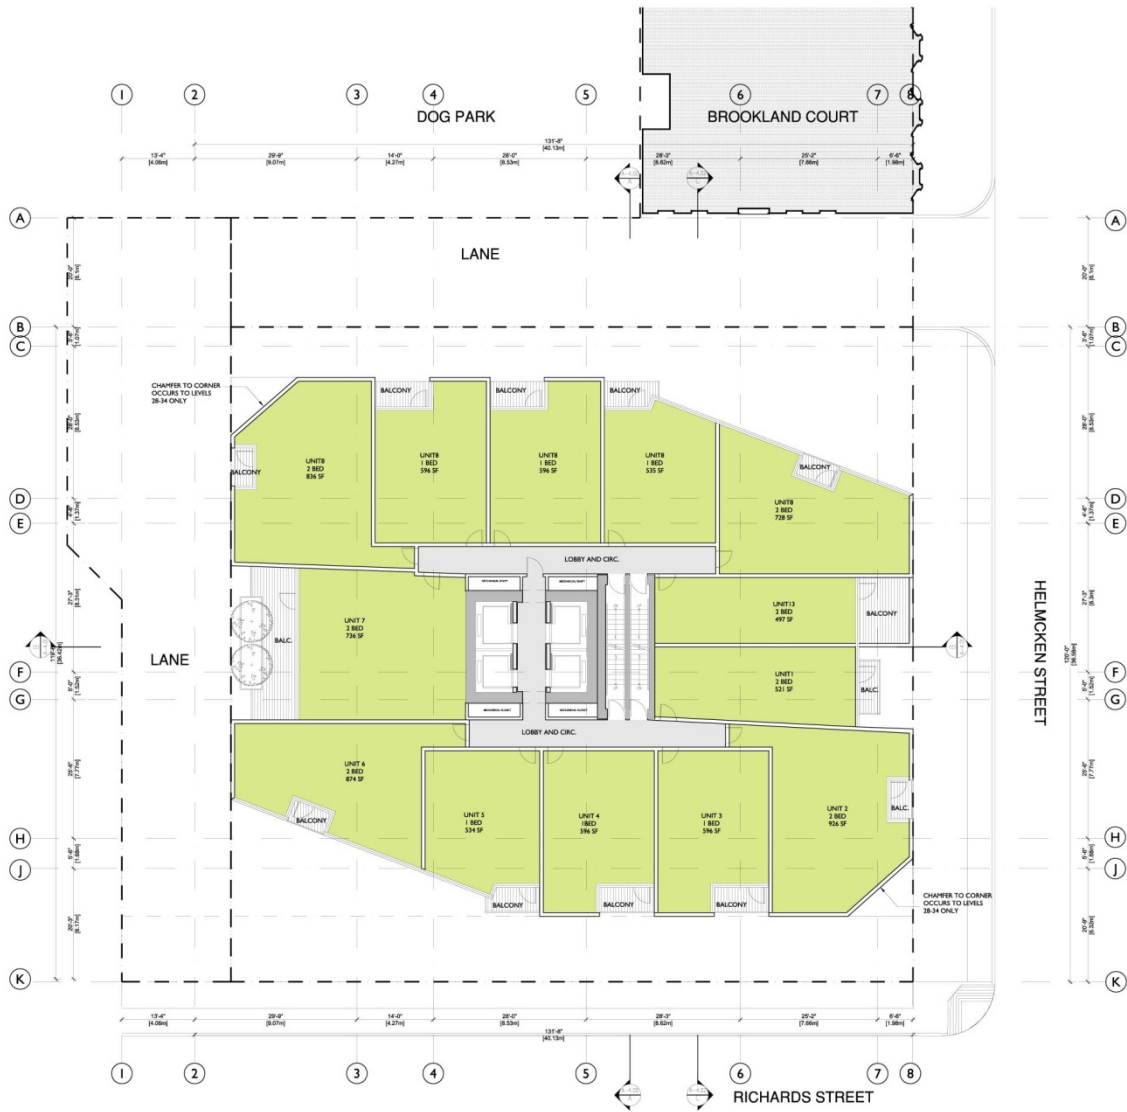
Typical Strata Floor Plan - Upper Levels 8-34
